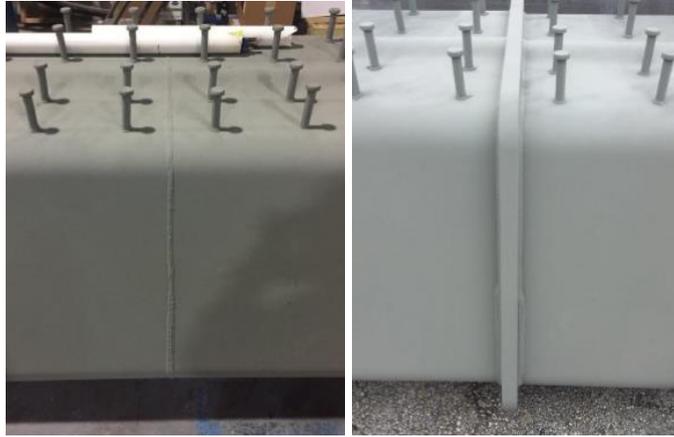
Two details to expand the span of FPG girder to 100 ft.
